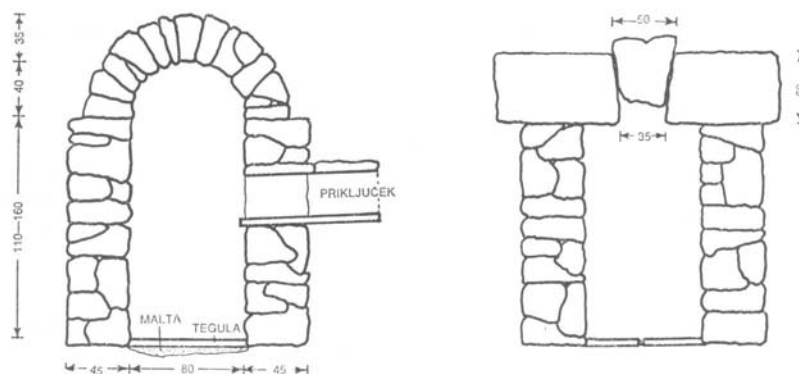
The Emona sewage system – channel cross sections; Source: Kolar (1983).
